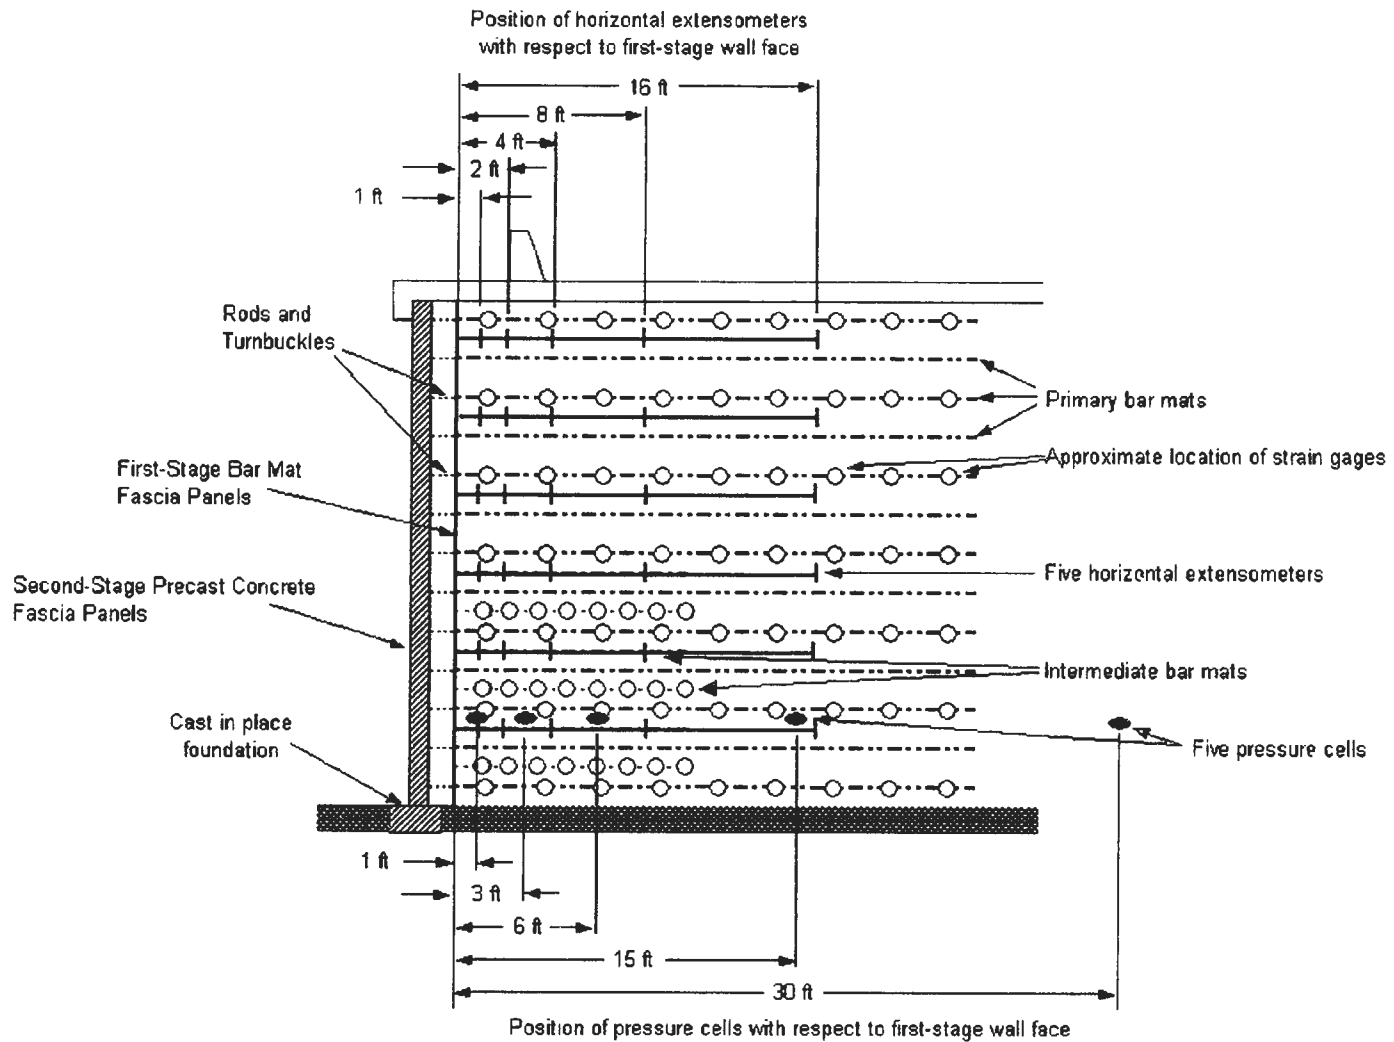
Elevation of MSE wall showing reinforcement, first-stage and second-stage faces, and instrumentation
